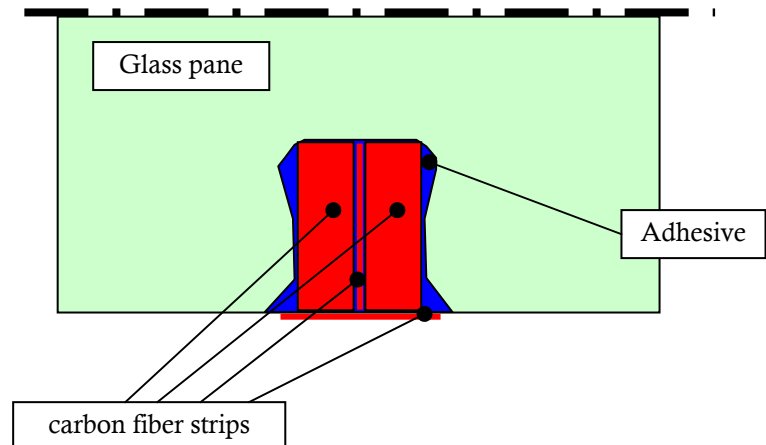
, Close-up of bottom of girder cross-section with reinforcement geometry for specimen 2.
